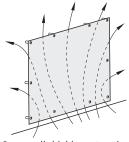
Open wall shield construction. Do not install spacers directly behind the stove or connector.
